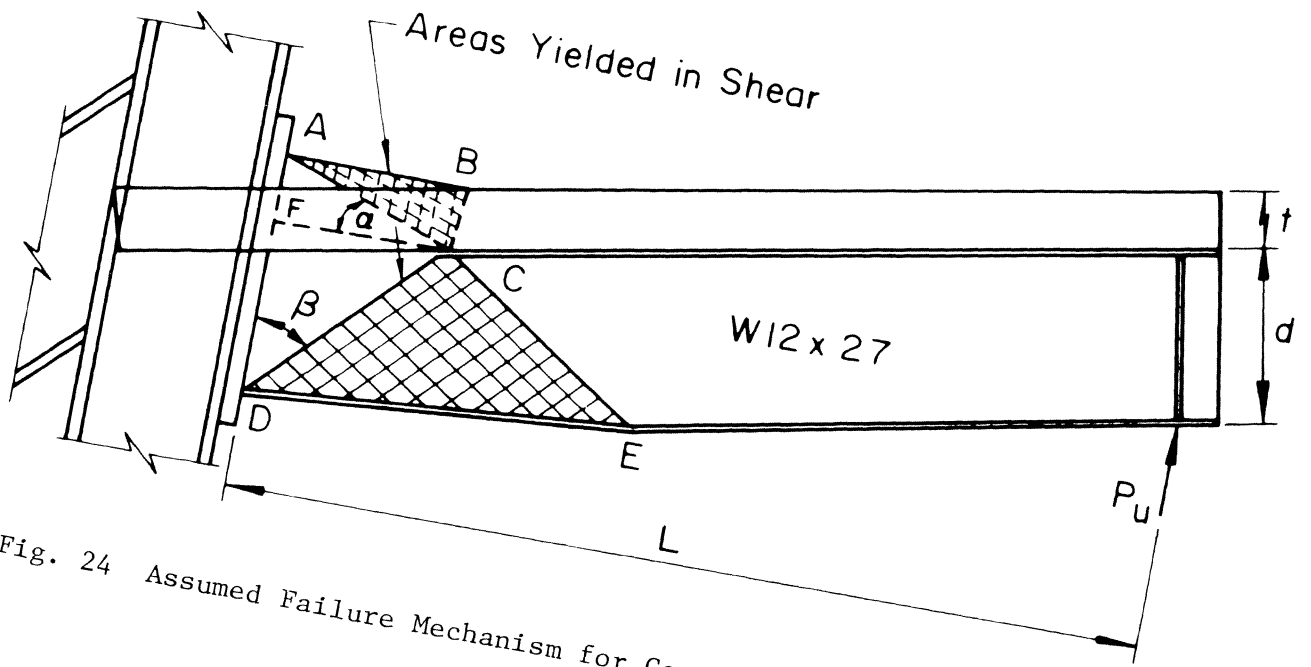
Assumed Failure Mechanism for Connections without Transverse Support
